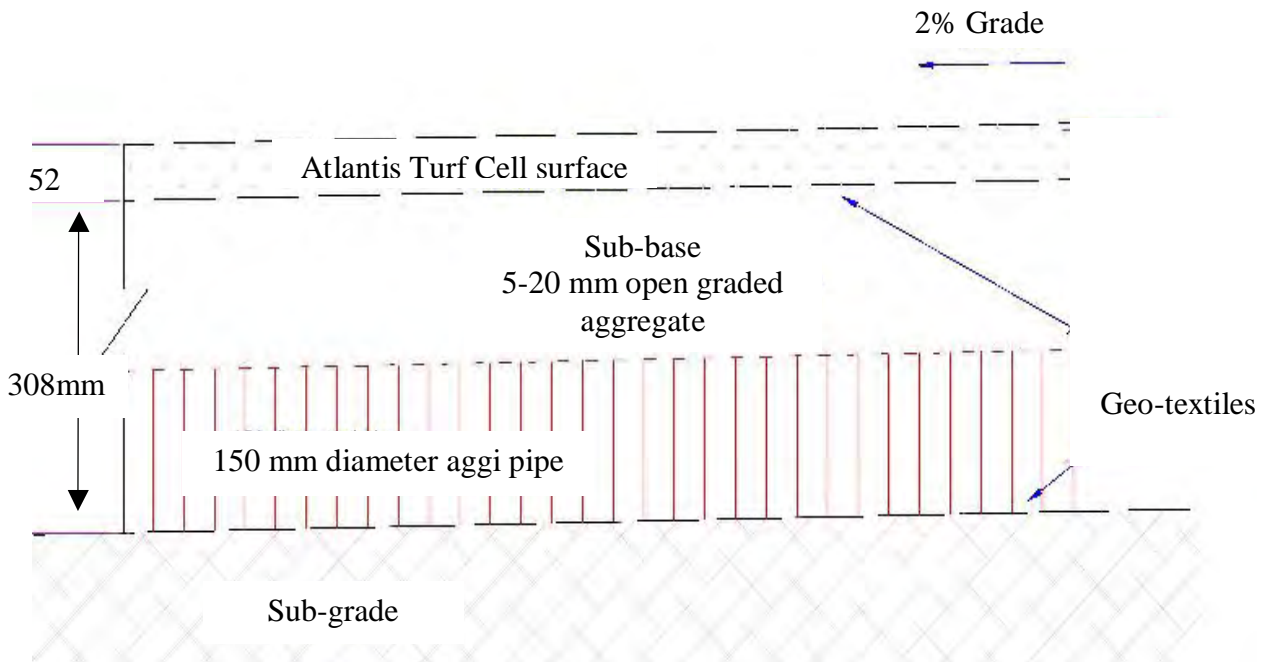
Cross section of Atlantis Turf Cell pavement
